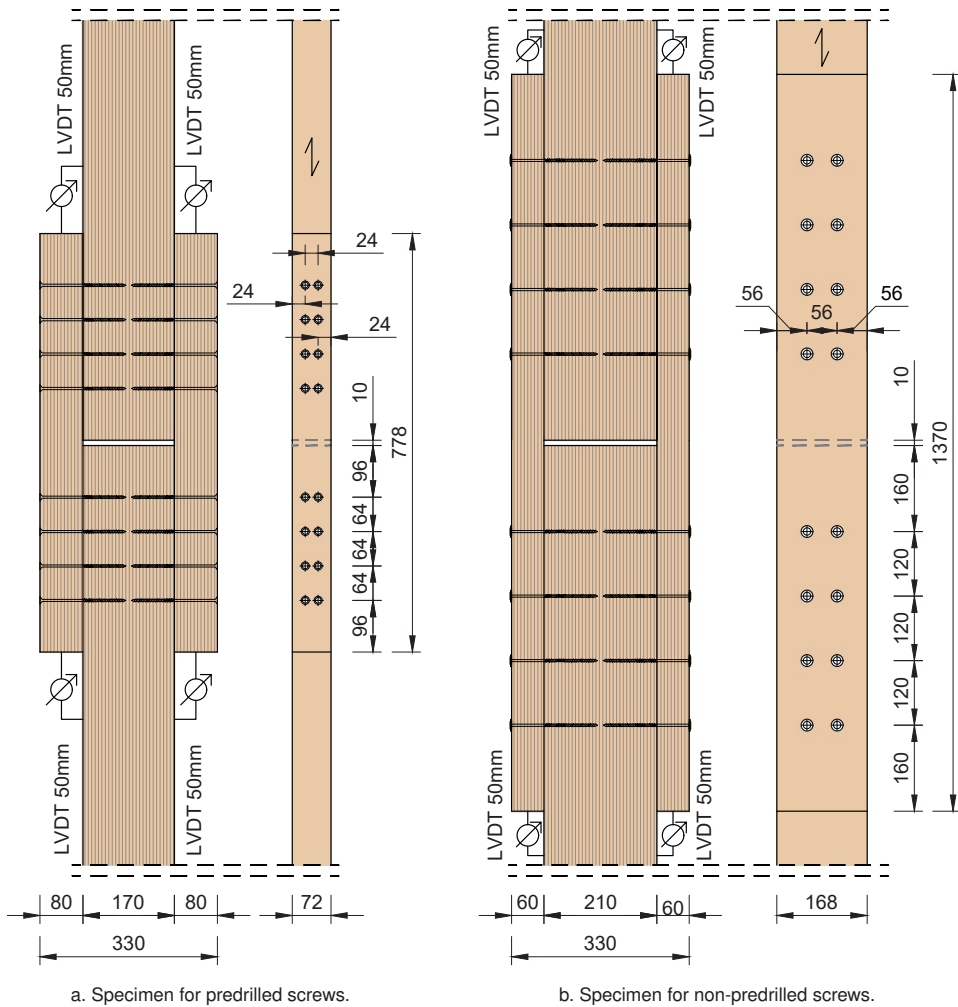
Schematic drawing of specimens for groups of screws, dimensions in mm.
